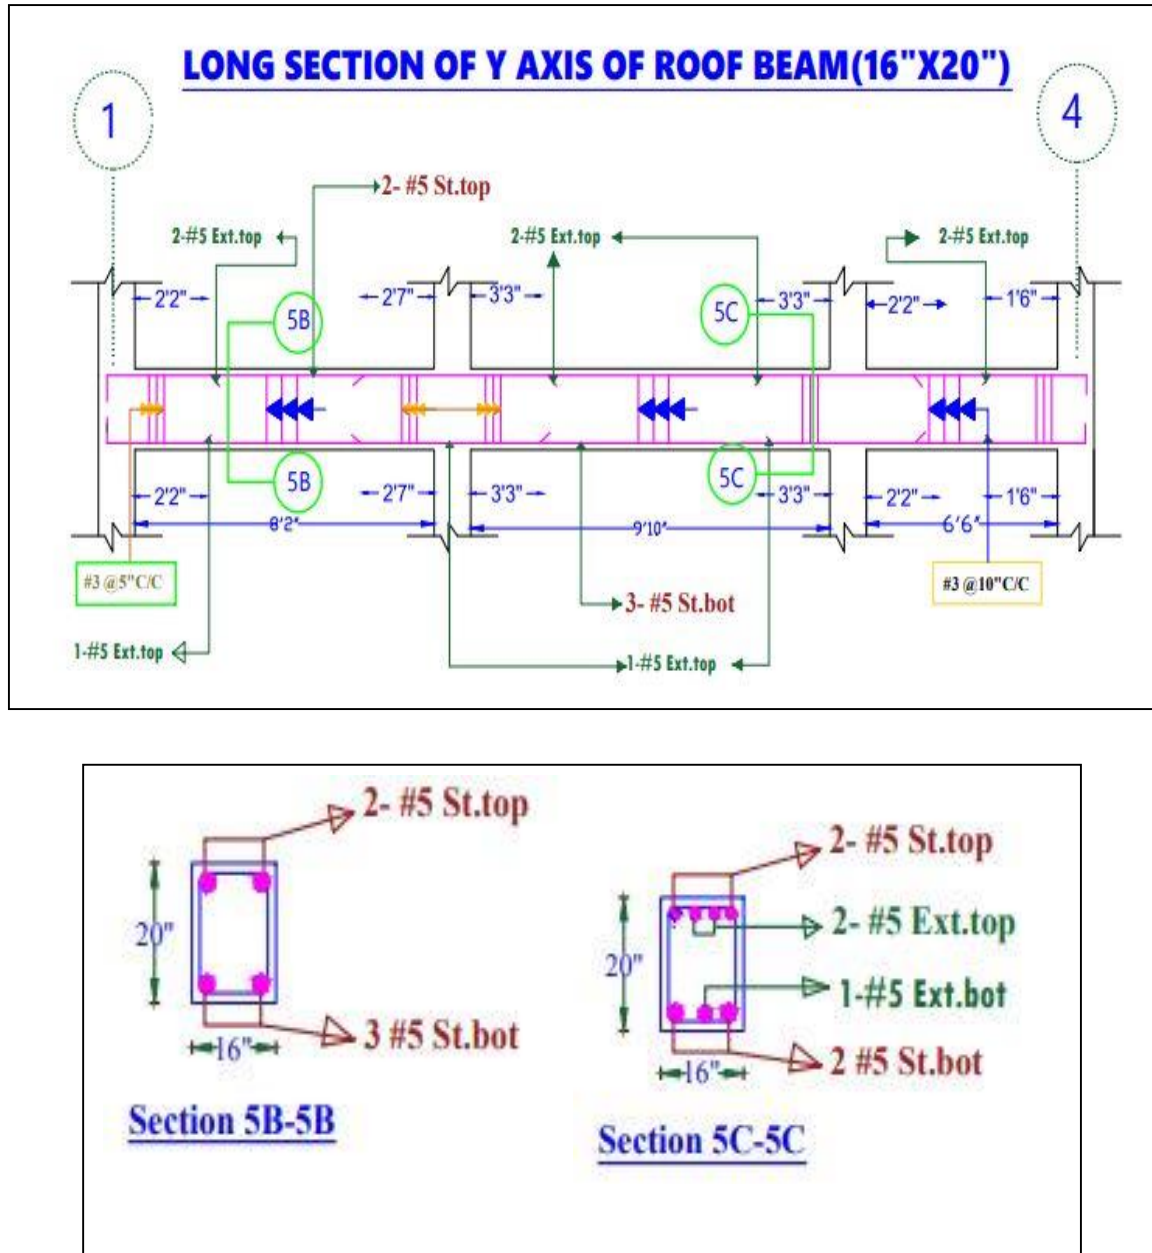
Beam Detailing & Cross Section of Y-axis
